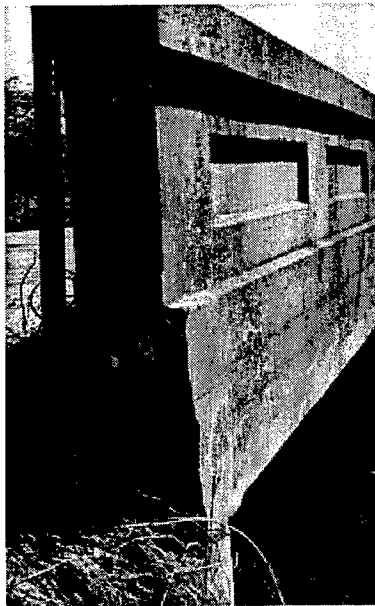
Bridge P-53-702 with a span of 23 ft over Saunders Creek
